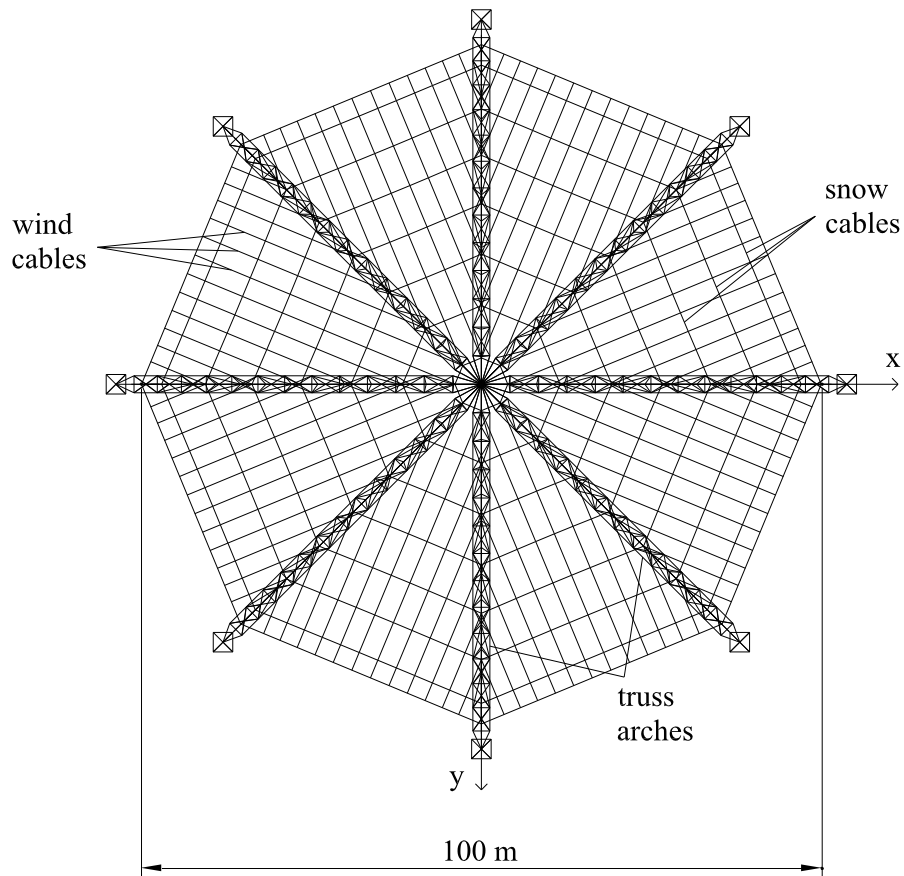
Floor plan of model 4, cable net supported by four truss arches
